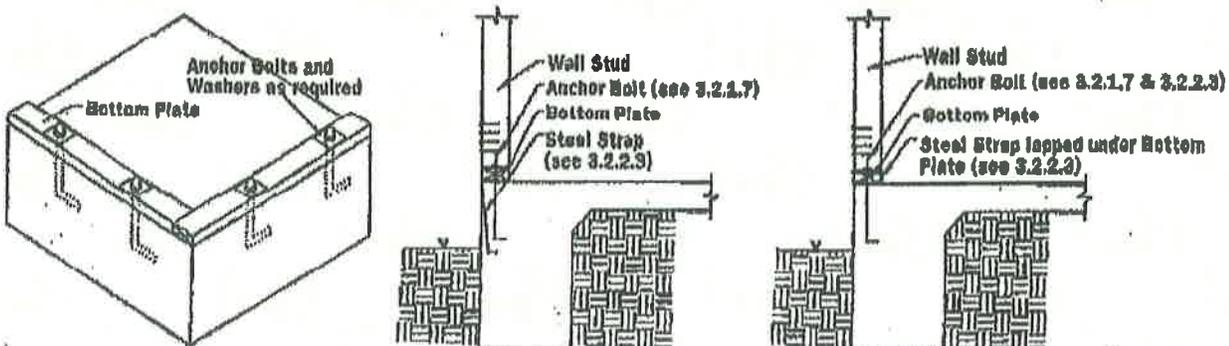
Bottom Plate Anchorage to Slab-on-Grade
